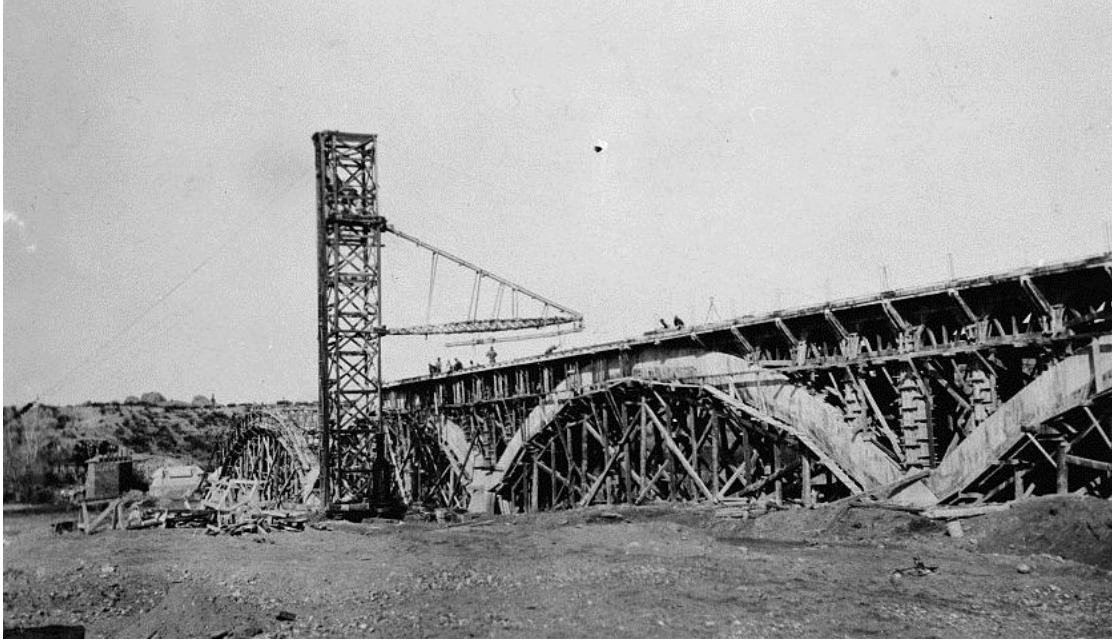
Ash Avenue Bridge under construction, 1912. Note dry Salt River bed. Source: U.S. Library of Congress, Washington, D.C.
